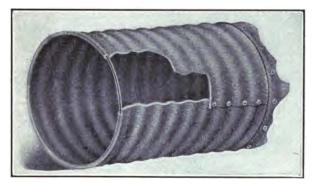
Corrugated pipe of ingot iron used for culverts.
